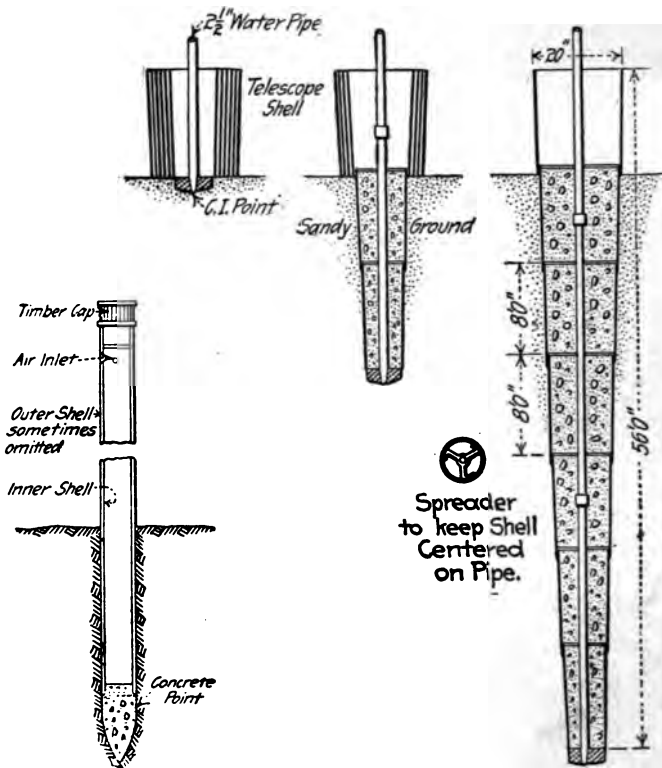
Simplex Pile Driving Form, Point and Cap.
